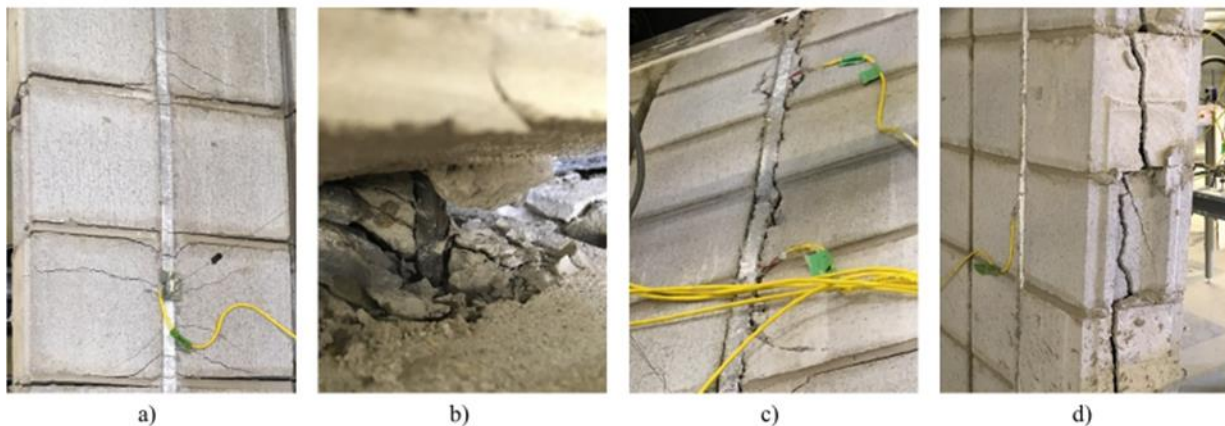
Damage to reinforced masonry walls during testing: a) herring bone cracks in wall NG3200); b) reinforcing bar fracture in wall CG3200; c) debonding of NSM reinforcement in wall NG3200; and d) cracking of CMU webs in NH3000
